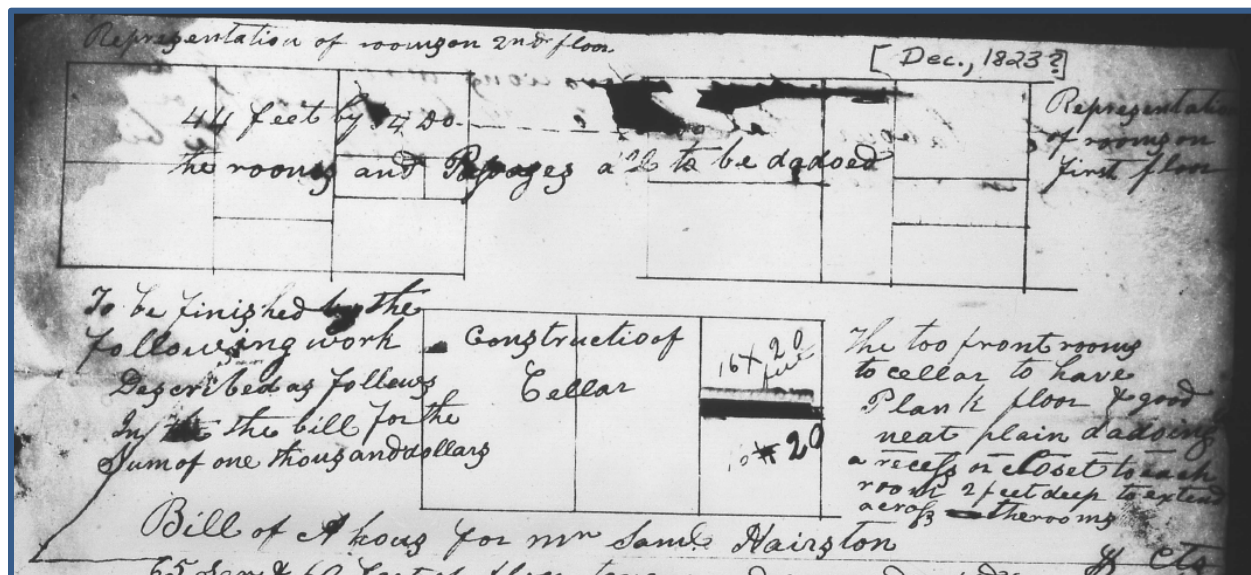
Floor plan for Oak Hill. Wilson-Hairston Family Papers.
